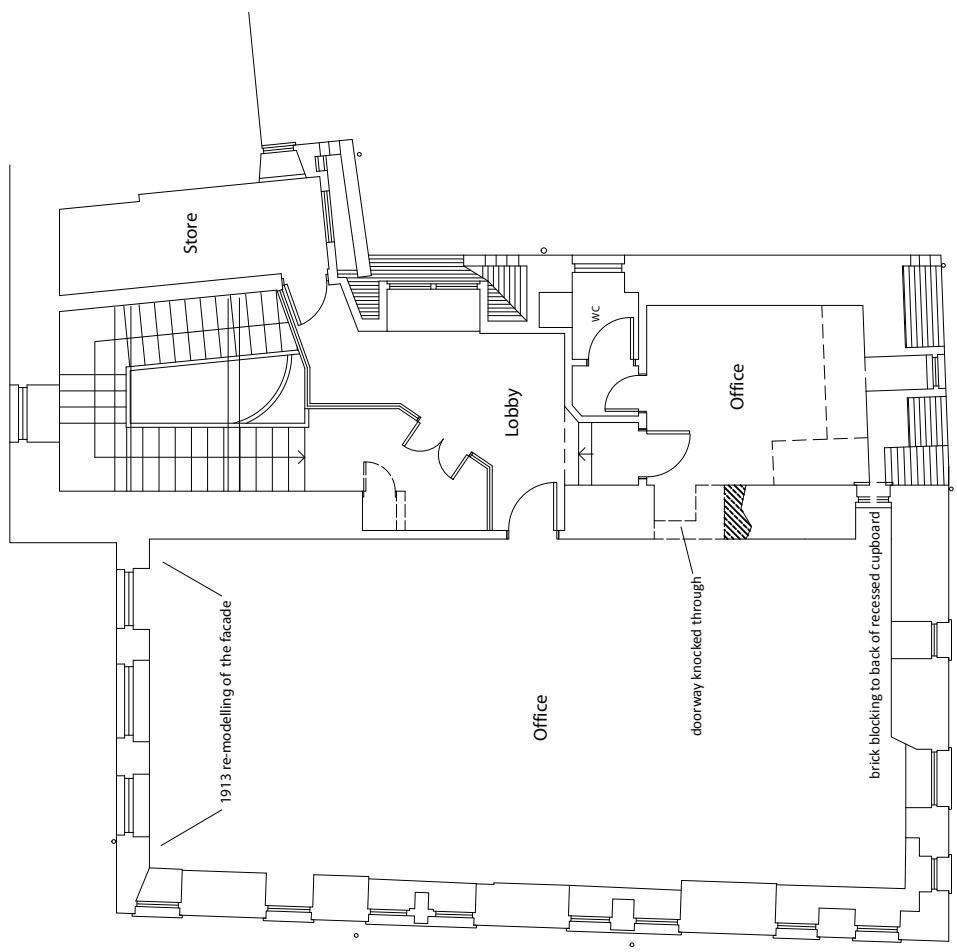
Cannonball House, first floor plan (plan supplied by client)
